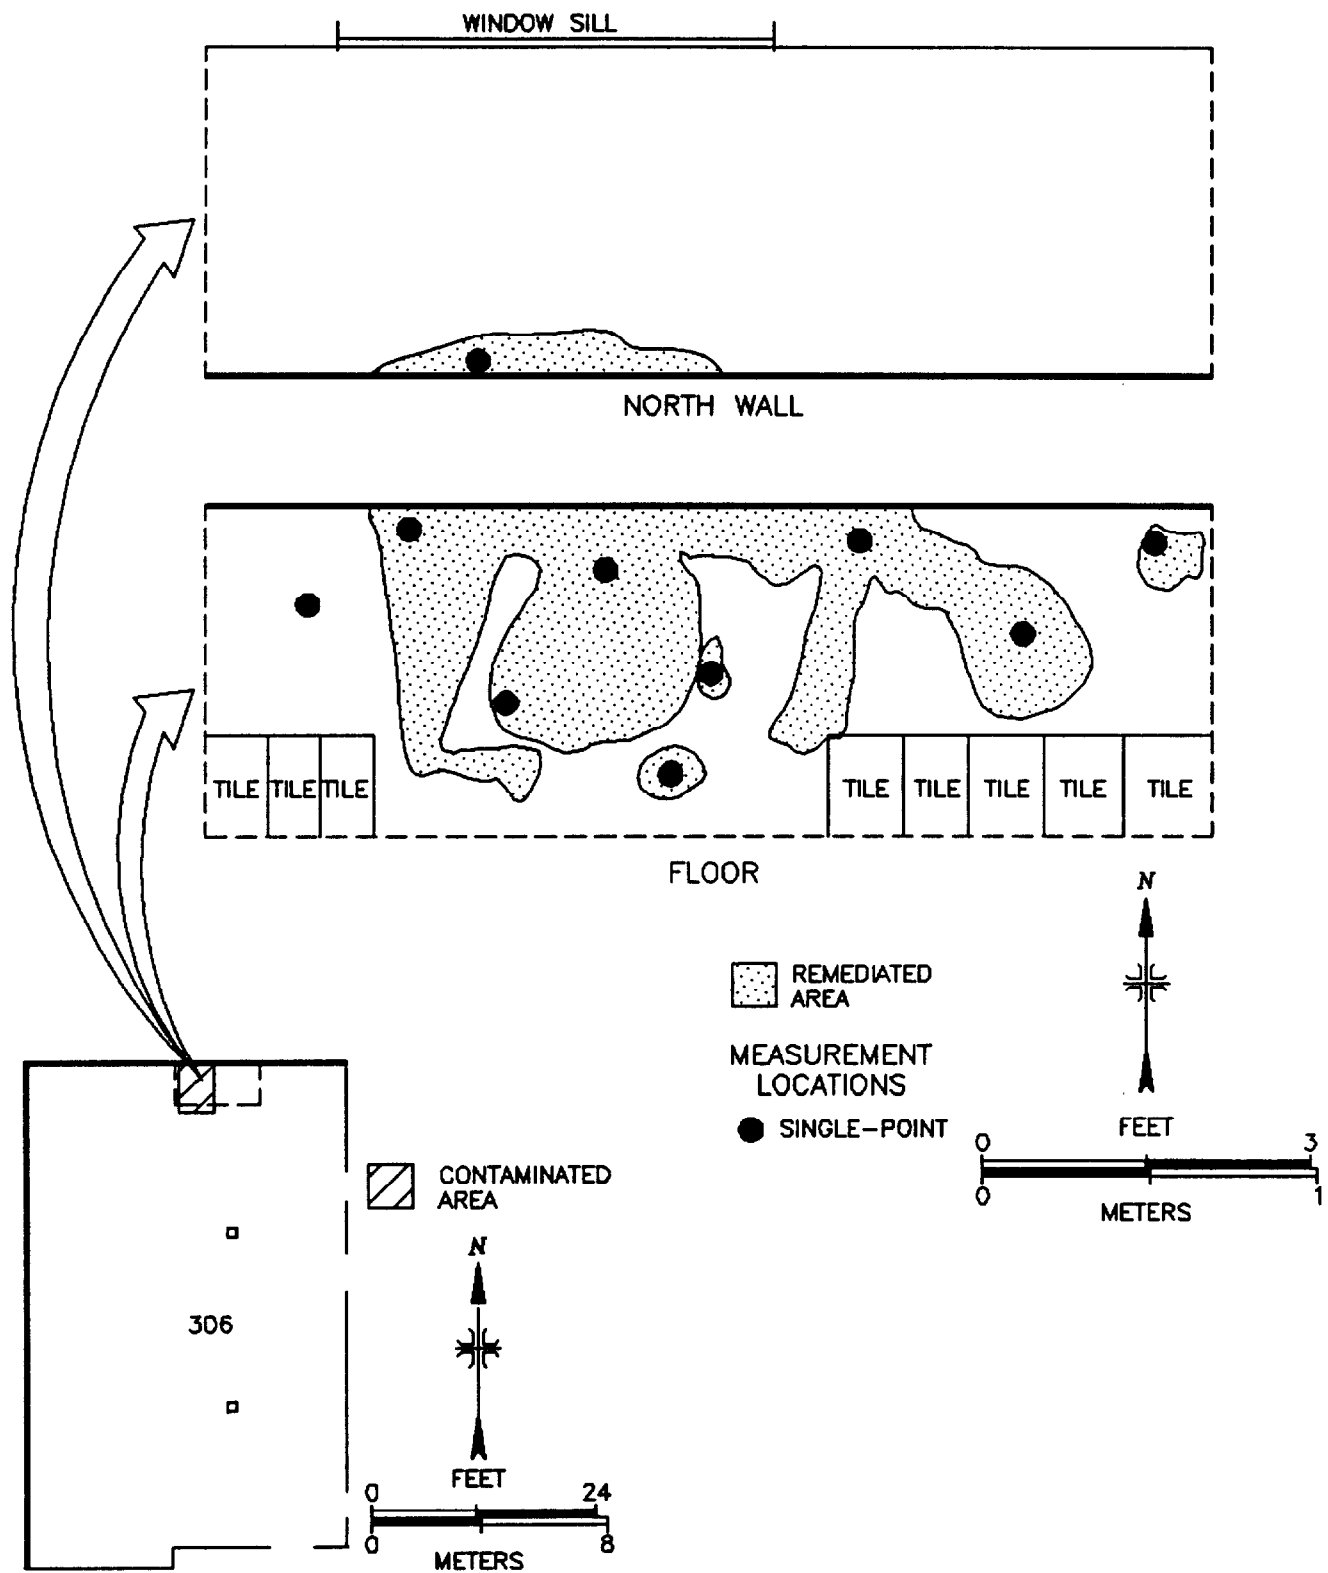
Building 1, Room 306 Floor and North Wall – Remediated Areas and Measurement Locations
